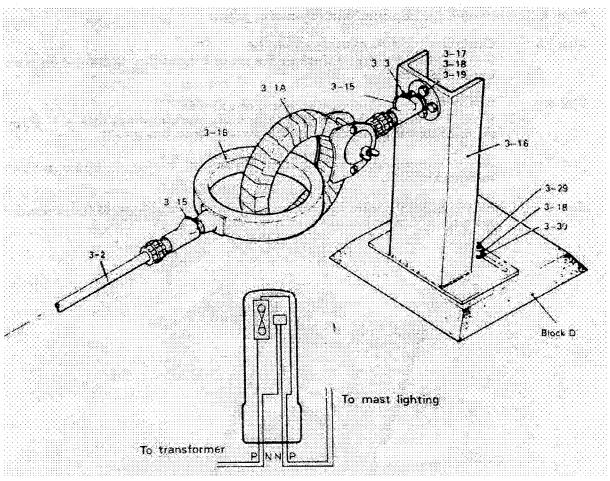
B – Lighting Transformer and Fuse Box Wiring
